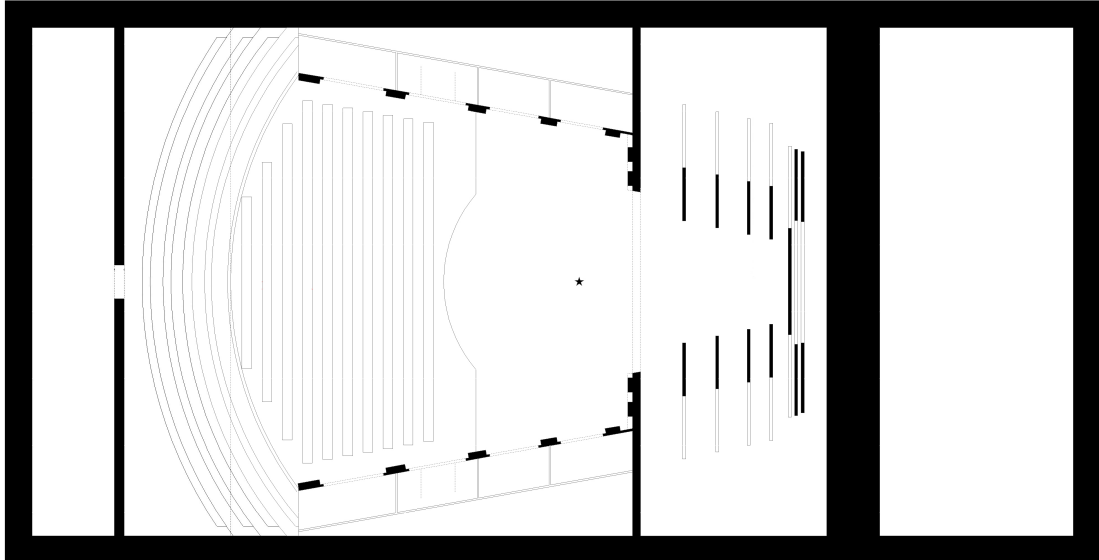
Conjectural plan for the Wren section. Fergusson 1999.
